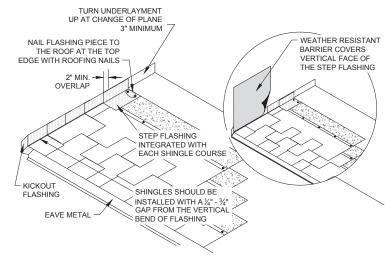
Step Flashing Application at Roof-to-Sidewall Transitions
